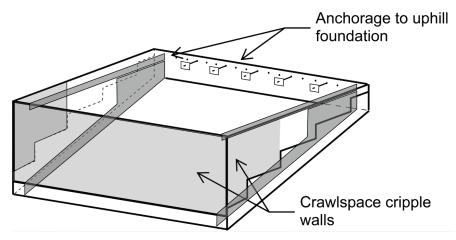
Hillside dwelling schematic isometric of dwelling crawlspace including anchorage to uphill foundation and crawlspace walls.
